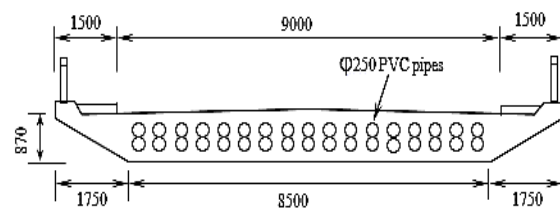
Cross Section at Hollow Core Part of the Deck Slab.
